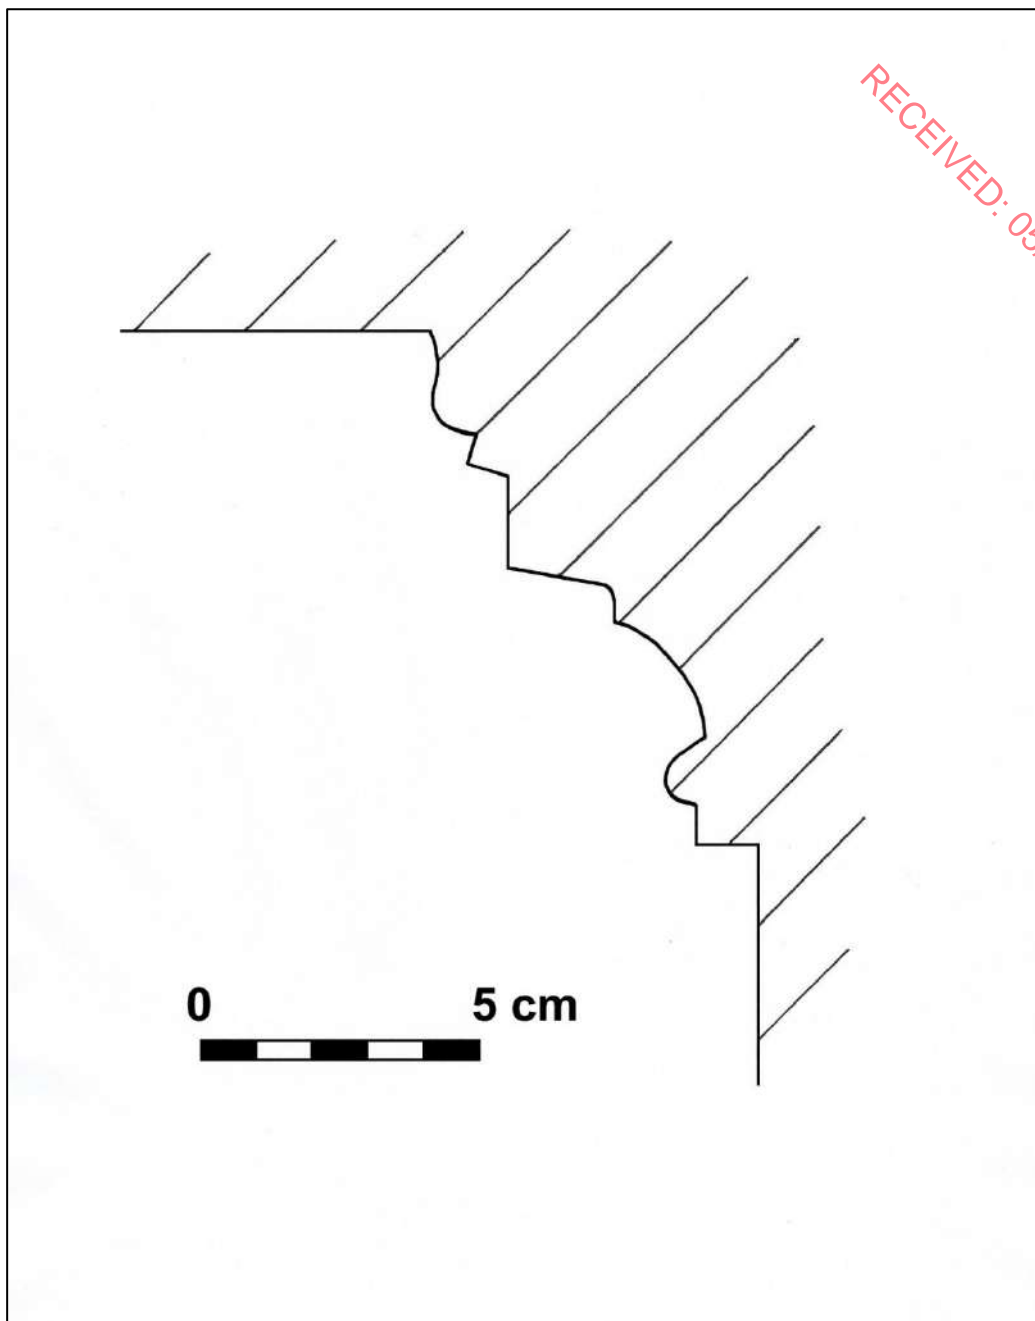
Section through coving moulding, northern wall of ground floor chamber.
